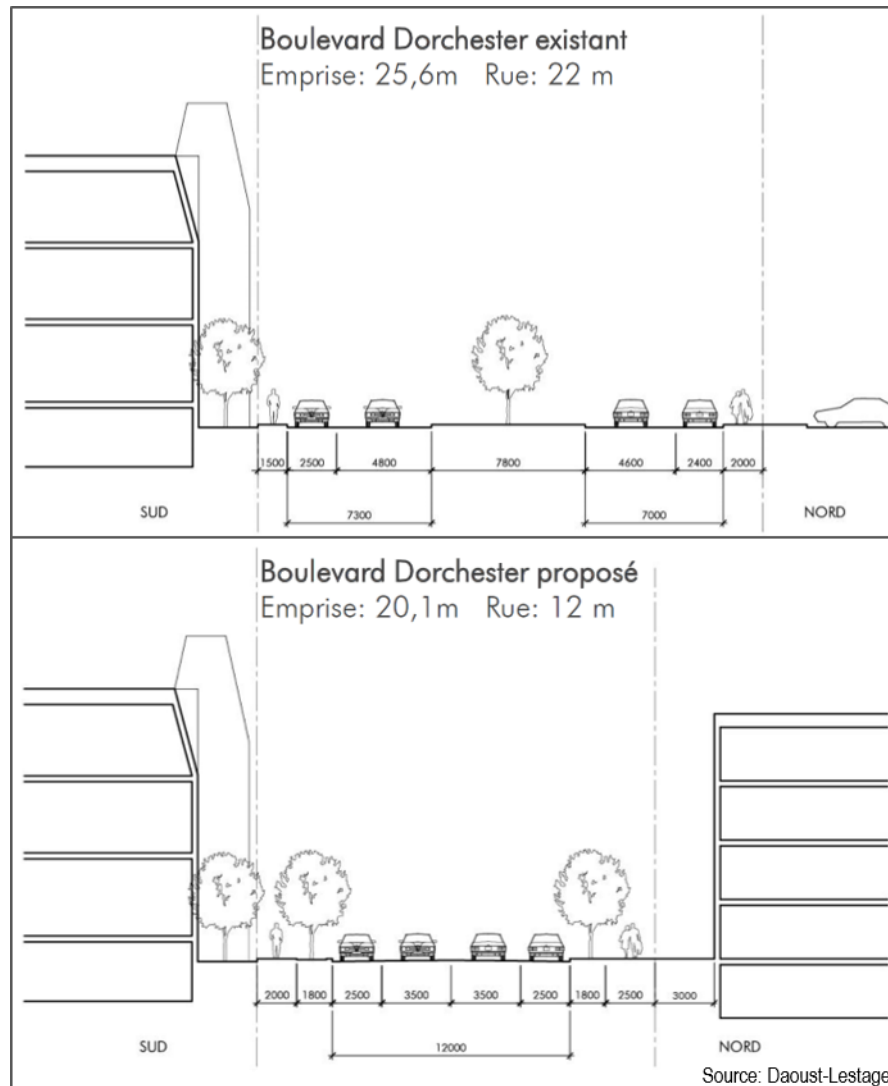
Cross-sections of the current and proposed Dorchester Boulevard
